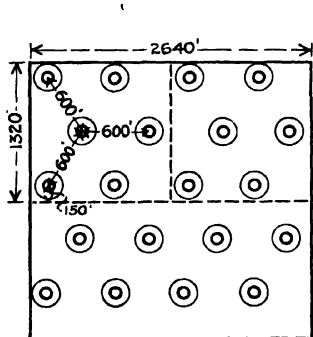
A typical storage "farm" equipped with both steel tanks and concrete-lined reservoirs.
